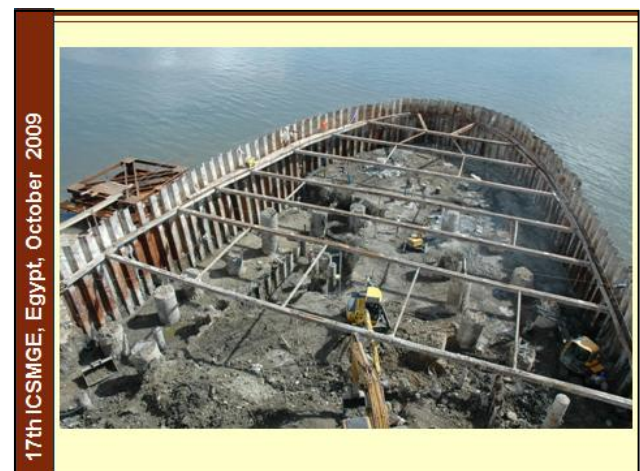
View of excavation works, bracing system, bored piles heads and jet grouting sealing slab.
